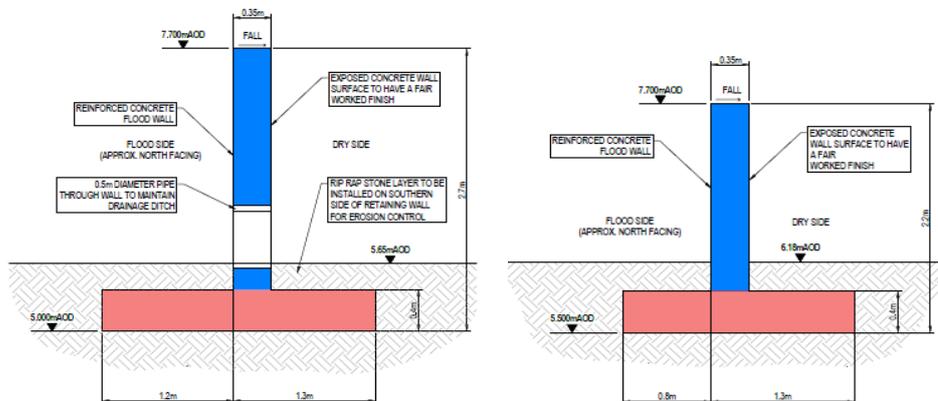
Sections B-B and C-C of Nash Industrial Estate Flood Wall, north of the Nash Sewerage Treatment Works.
